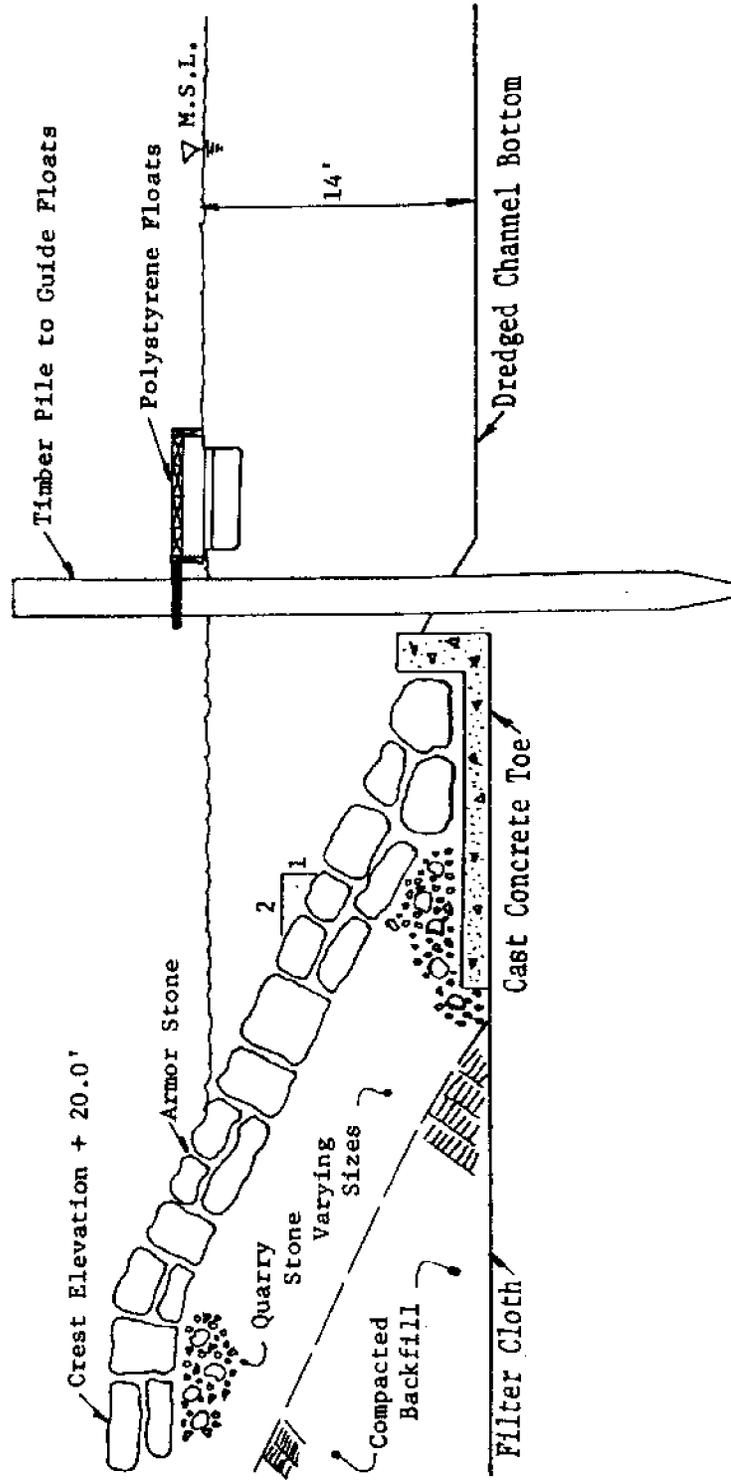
SECTION THROUGH CHANNEL RIP-RAP PROTECTION
